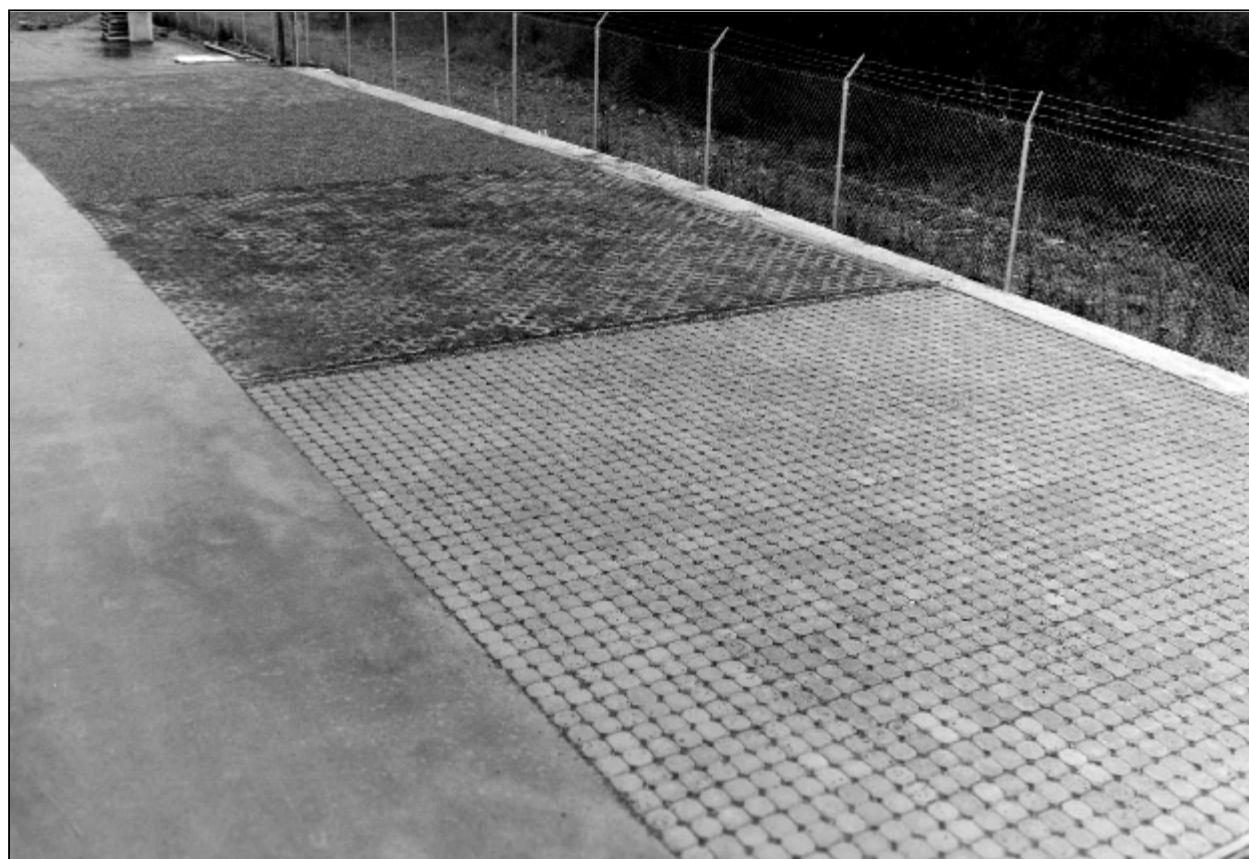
Photo showing several types of pervious modular pavement installations.
